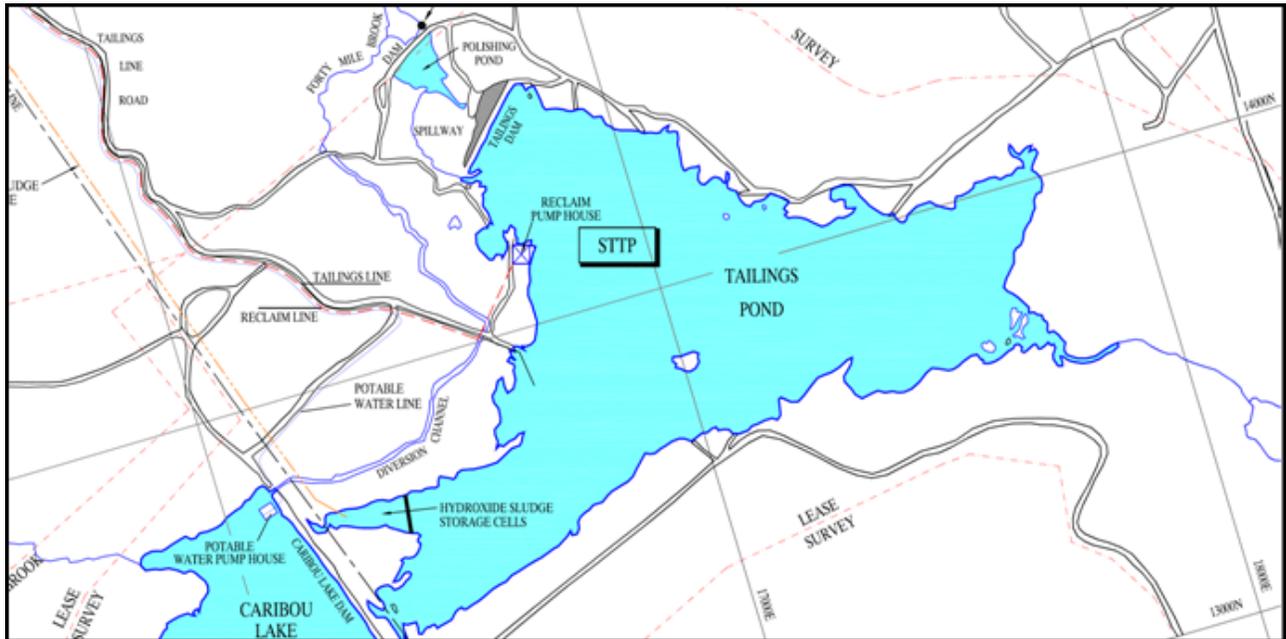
General Layout of South Tributary Tailing Pond (STTP)
